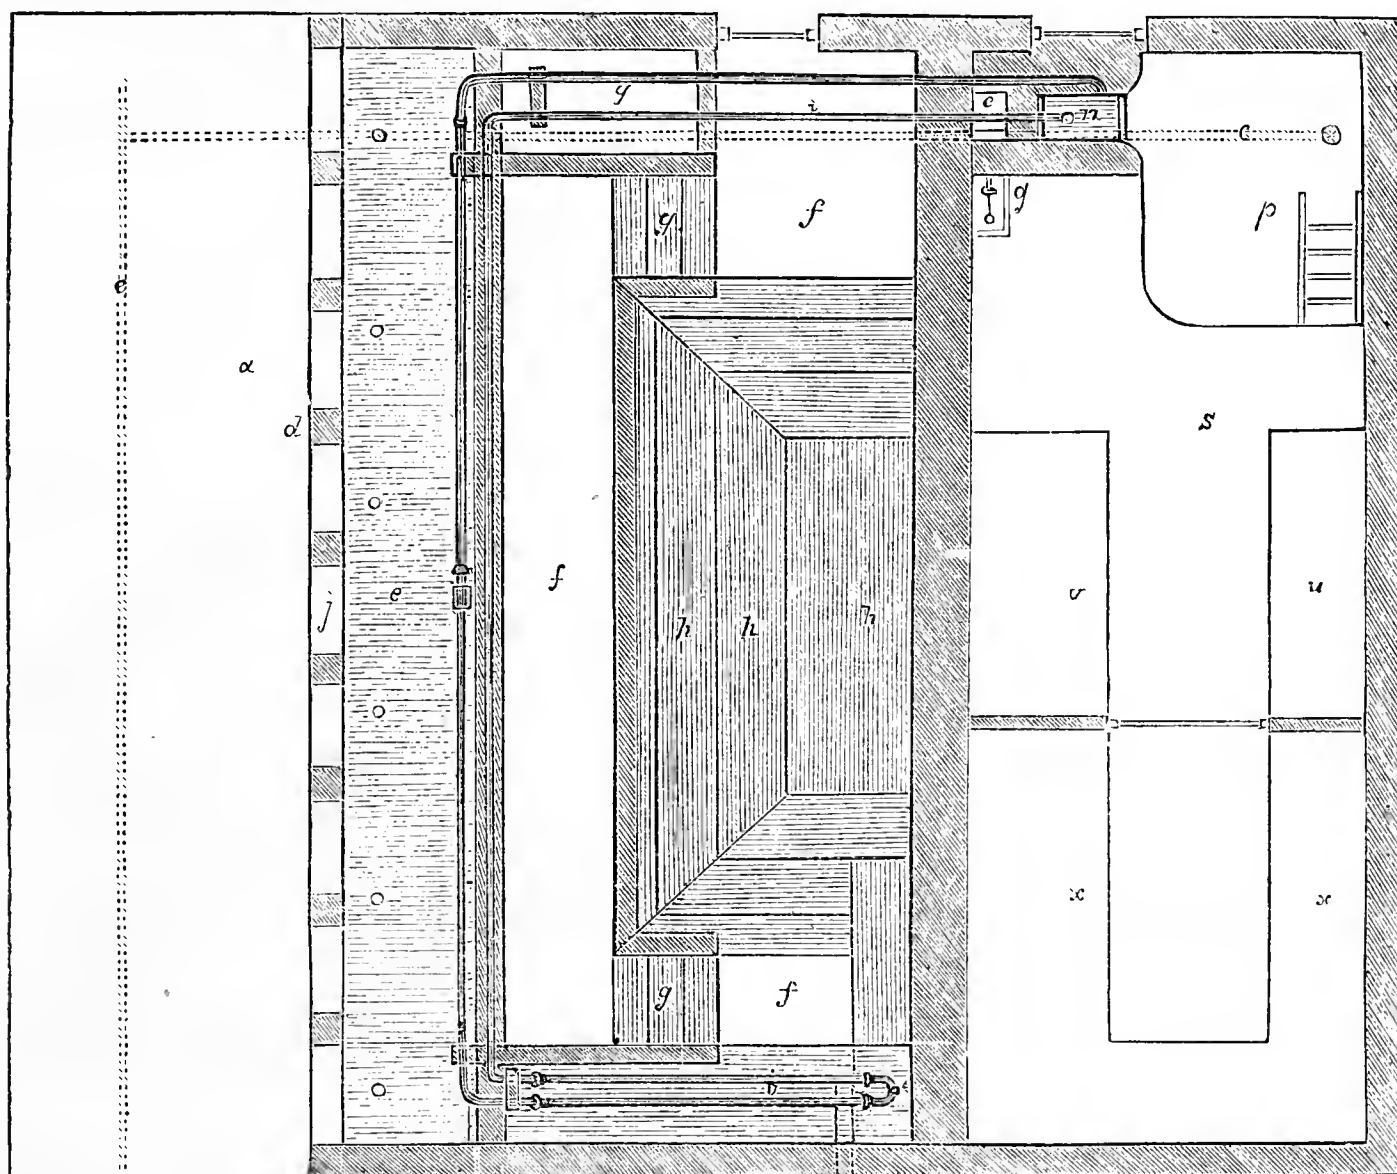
LEAN-TO HOUSE—GROUND PLAN.
